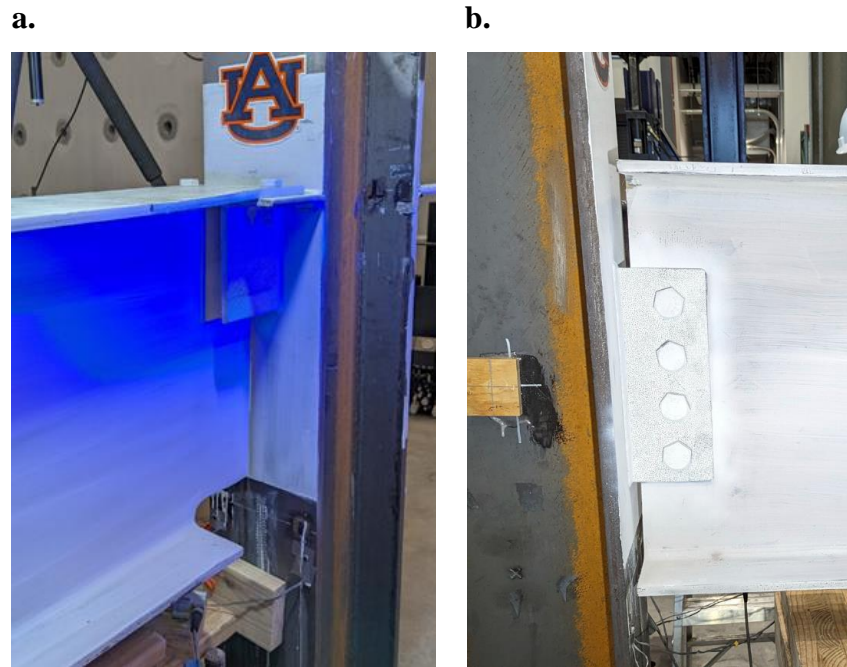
Test 3 After Testing (a) Connection E and (b) Connection F
